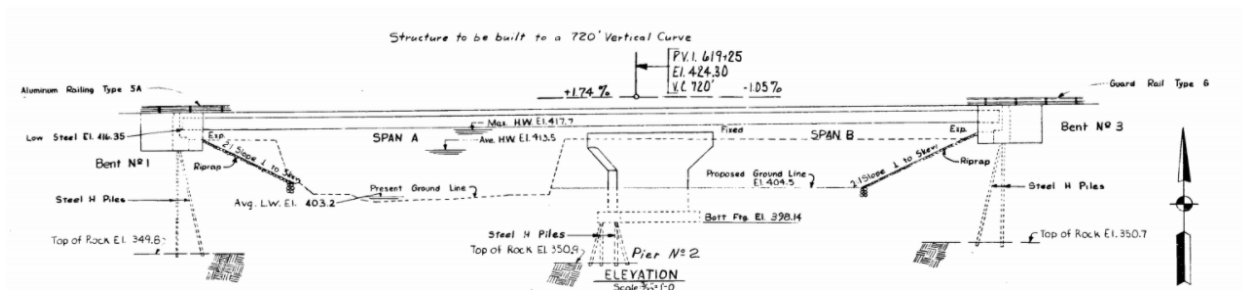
Elevation View of the Bridge (NBI 22190) (1981)
